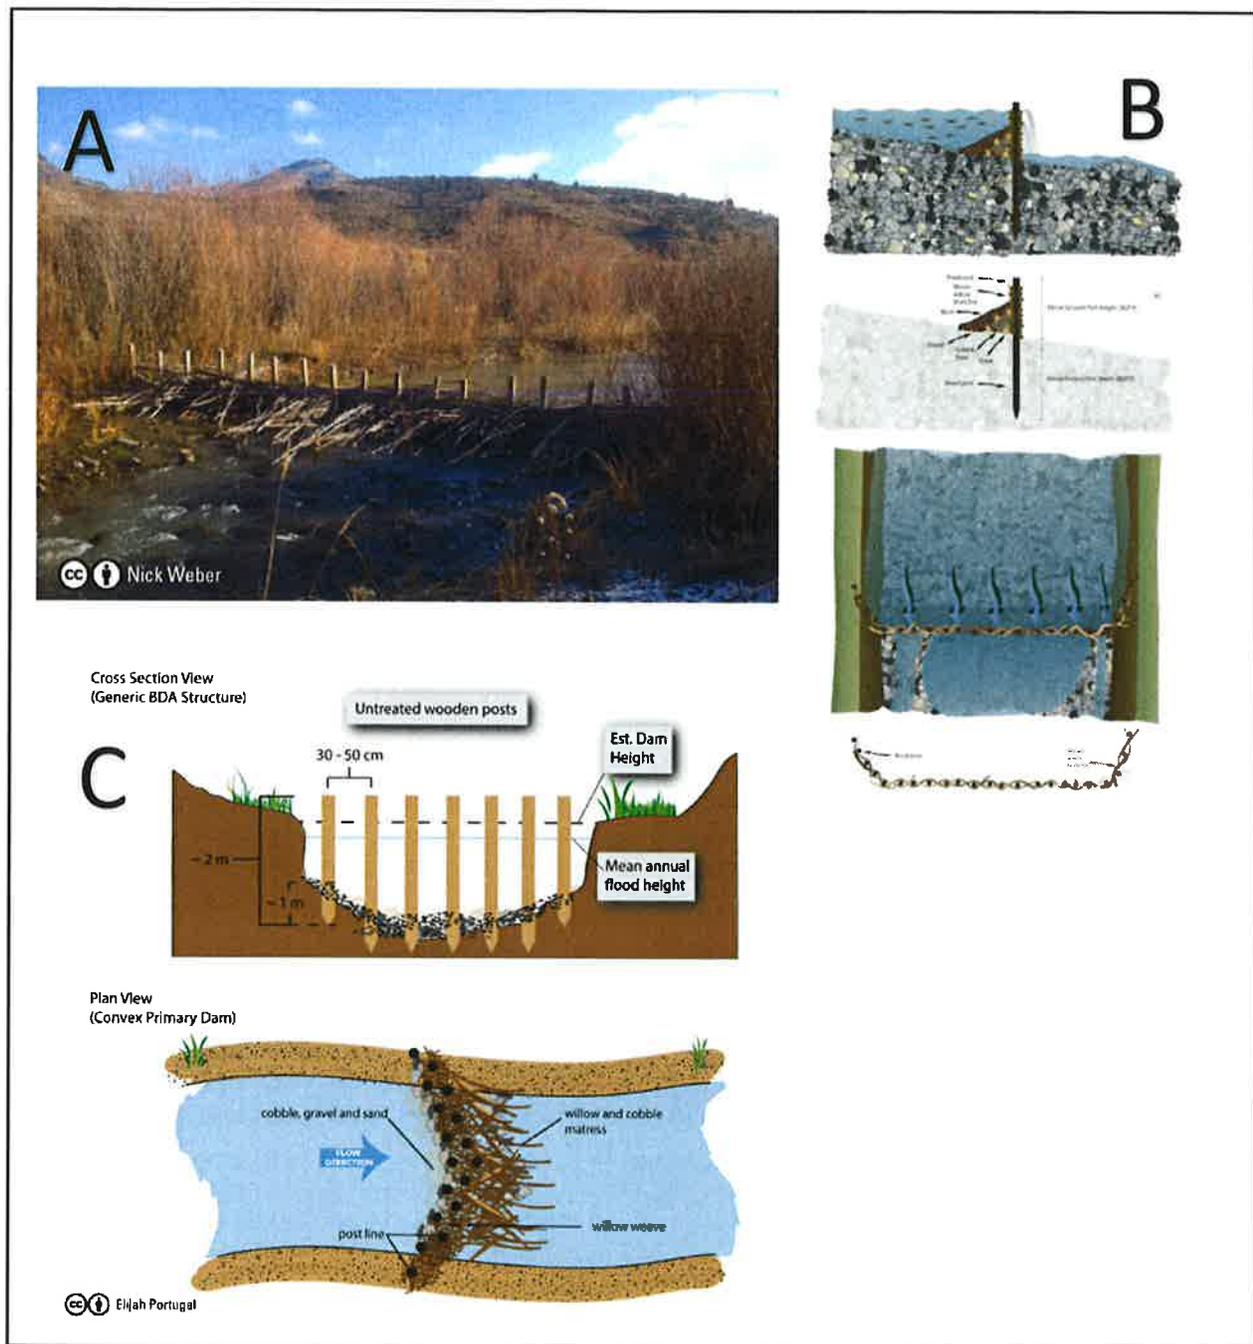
Image of channel spanning beaver dam analog that will be constructed on the South and West forks of Mink Creek (A). Image B shows the pooling of water that will create fish and amphibian habitat and (C) shows the cross section and plan view of the BDA constructed with untreated posts.
